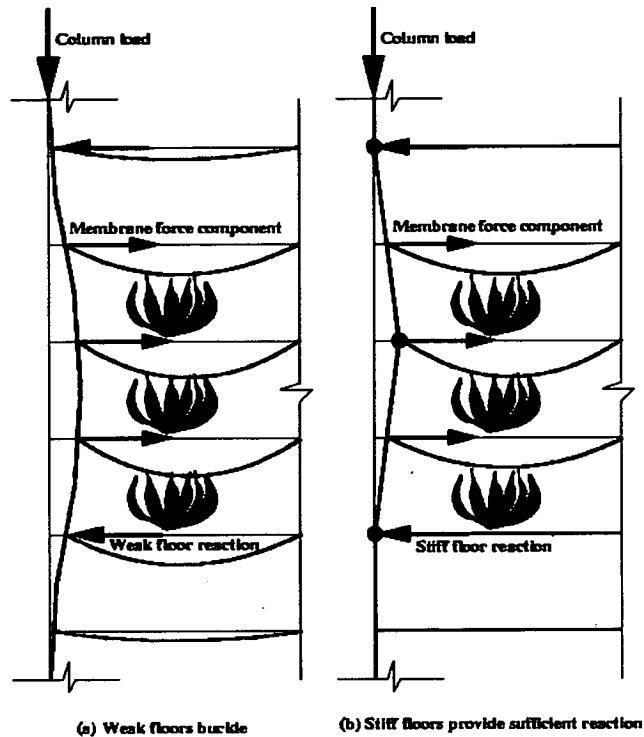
Mechanics of fire induced collapse in weak and stiff floor buildings
